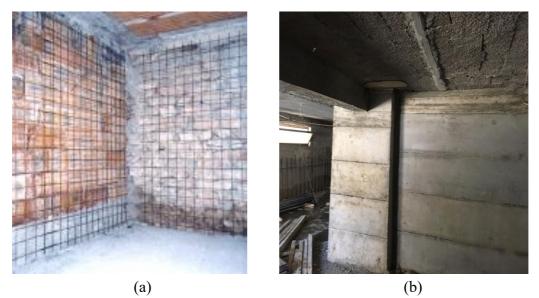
Jacketing process of masonry walls in the underground floor (a) step 1 and (b) step 2
